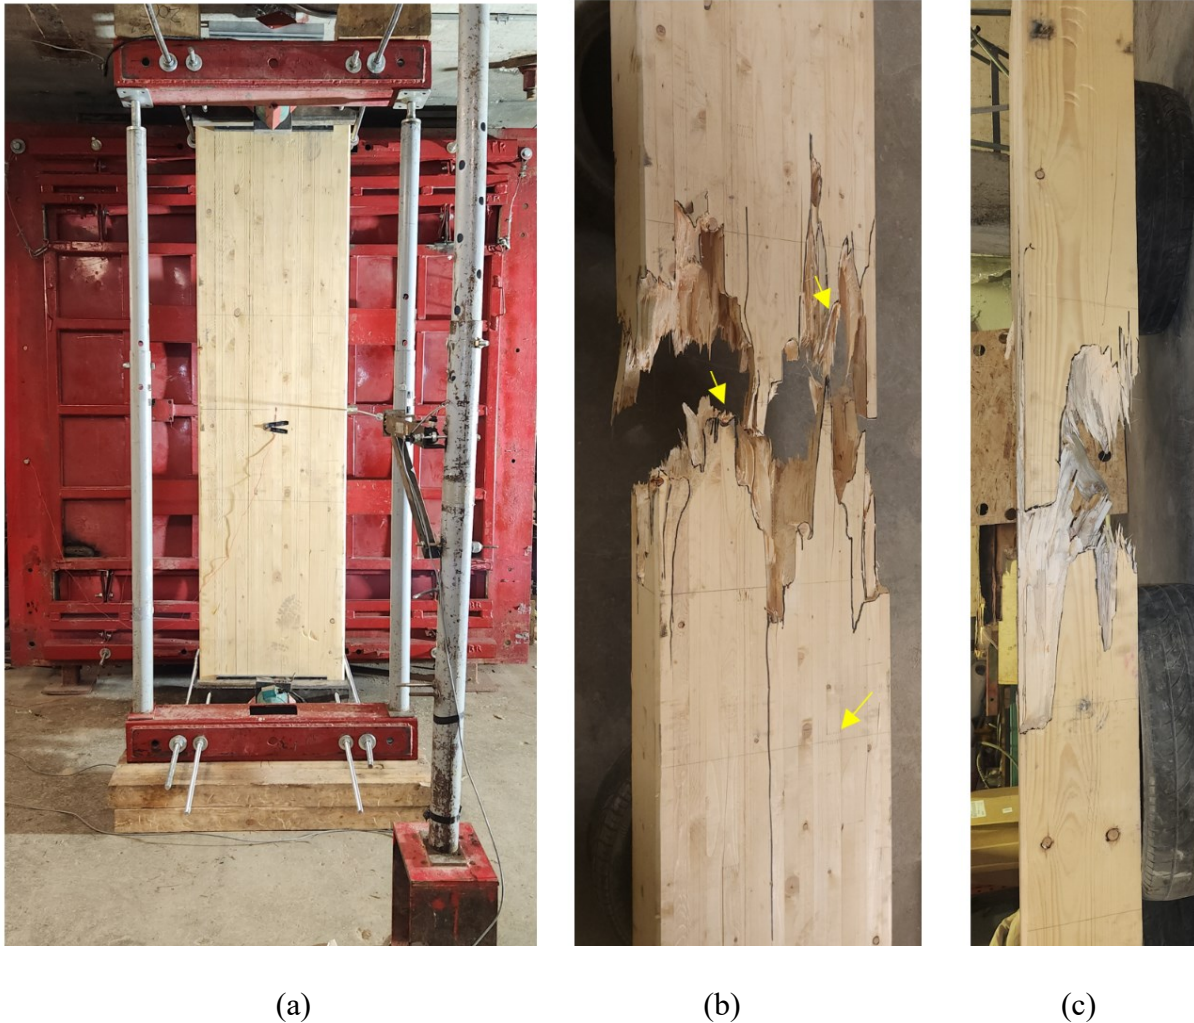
Dynamic Failure of GLT16 [215]: (a) Before test; (b) After test - front view with FJ locations; (c) After test - side view
